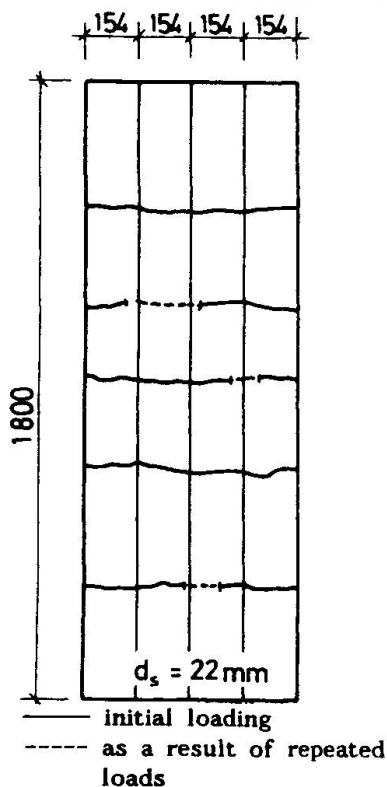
Crack pattern of intended centrally reinforced specimen S 22
